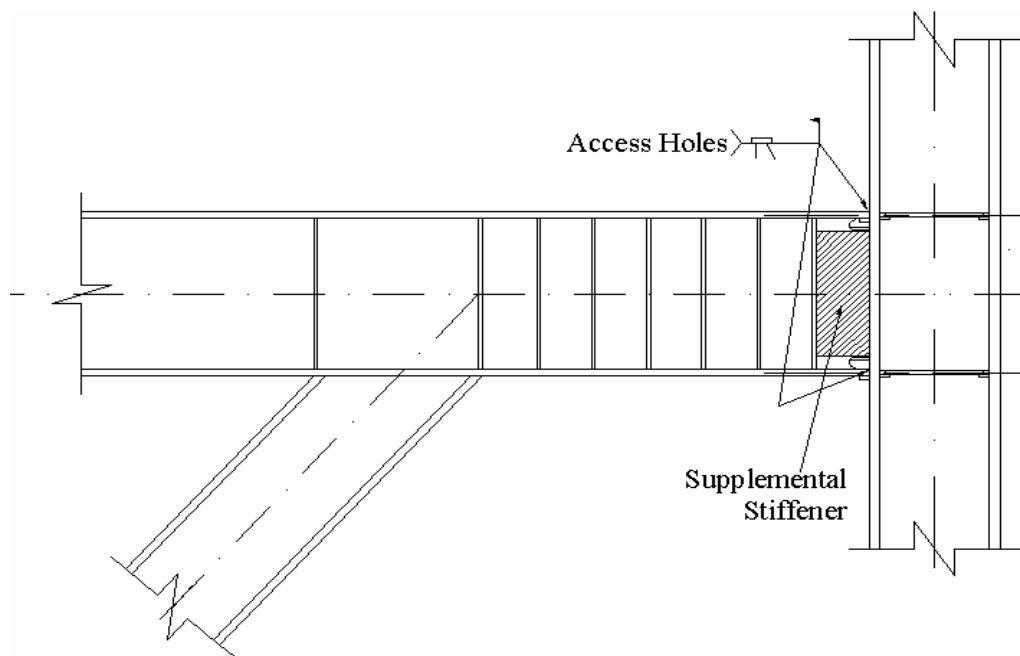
Concept of the “Reinforced” Link-to-Column Connection Detail (Phase II)
